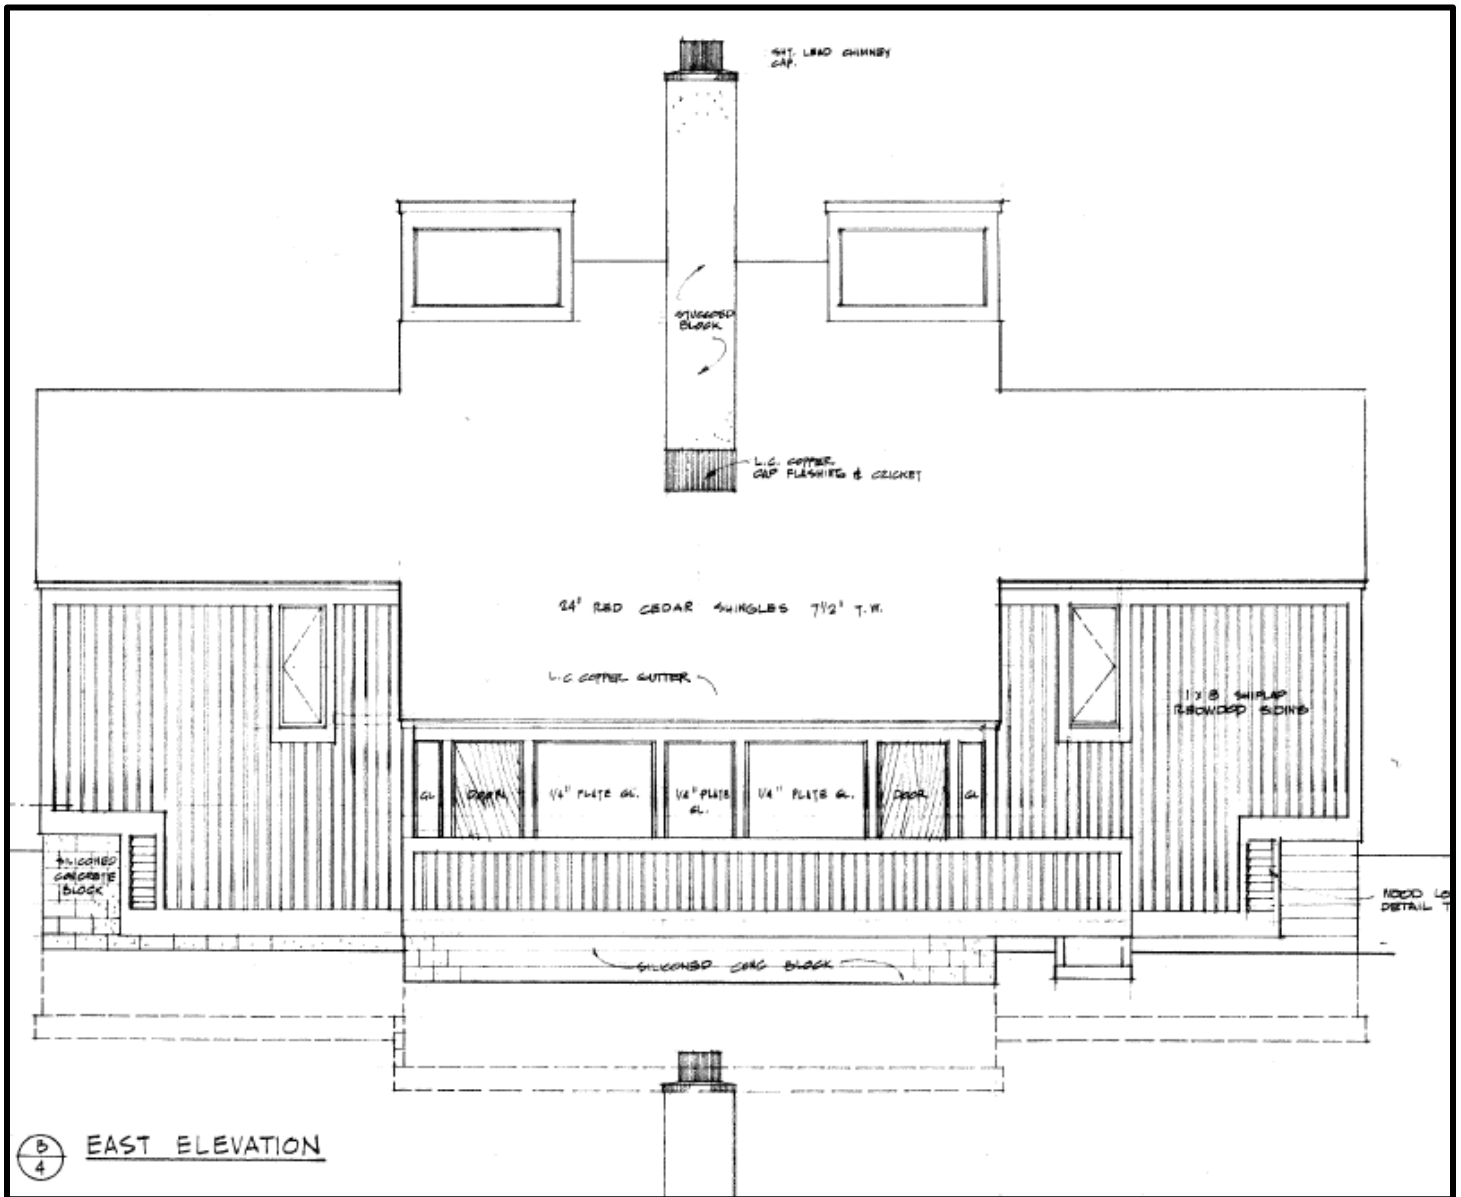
East Elevation, Guest House (Architect's drawings, 1962).
